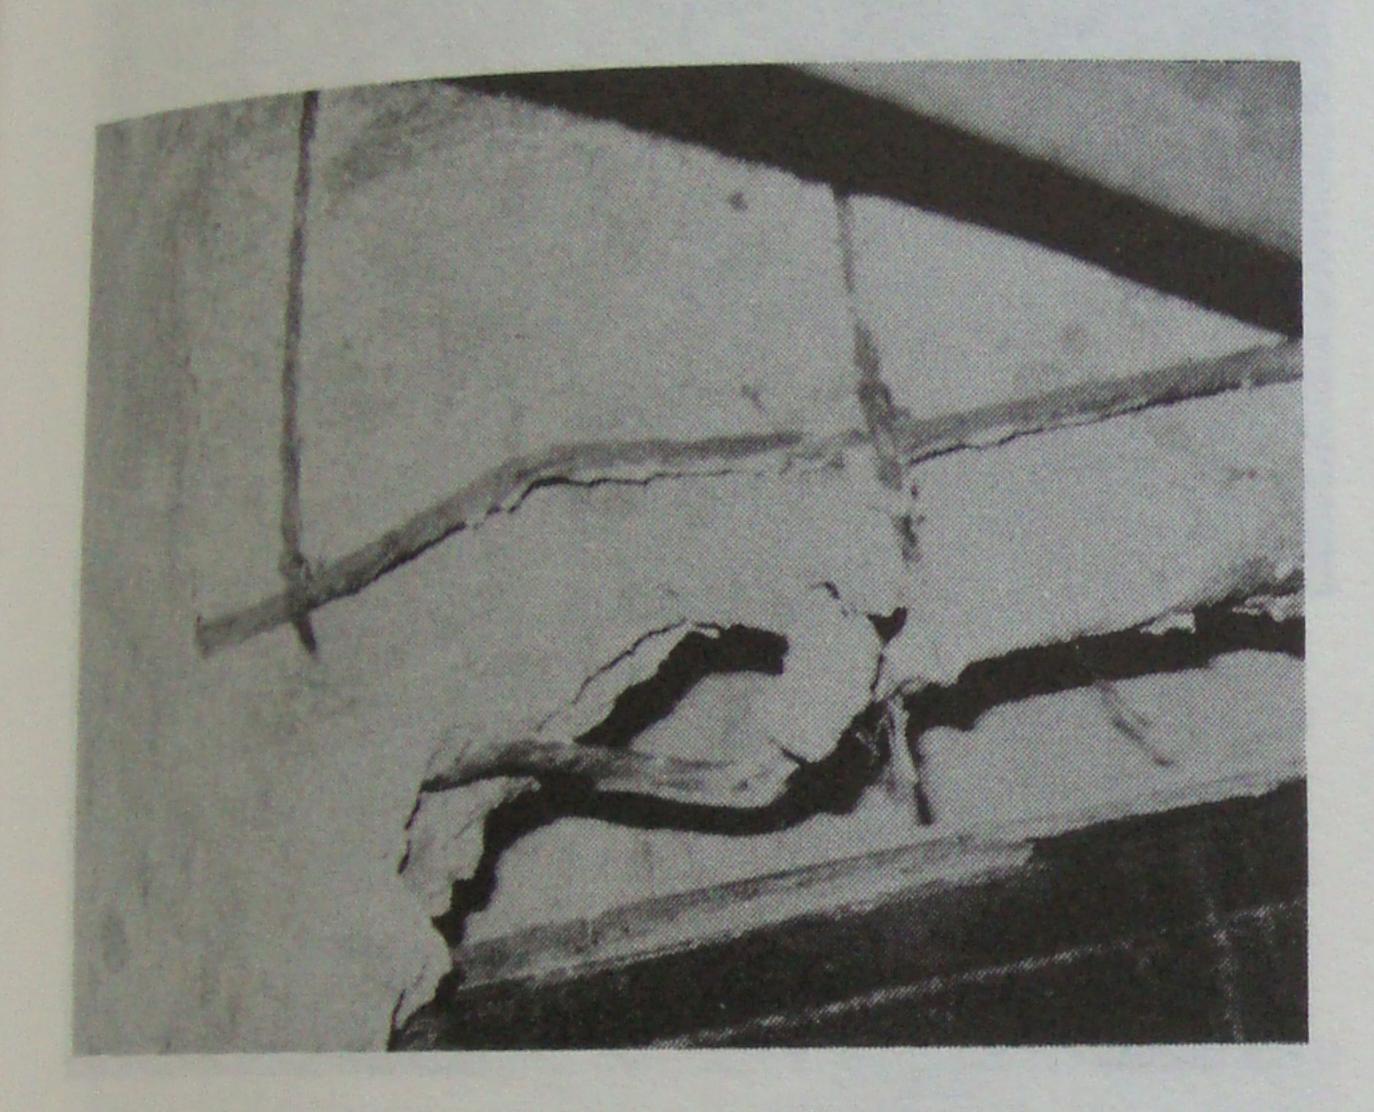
Buckling of bottom bars in beam of 9 storey office building.
